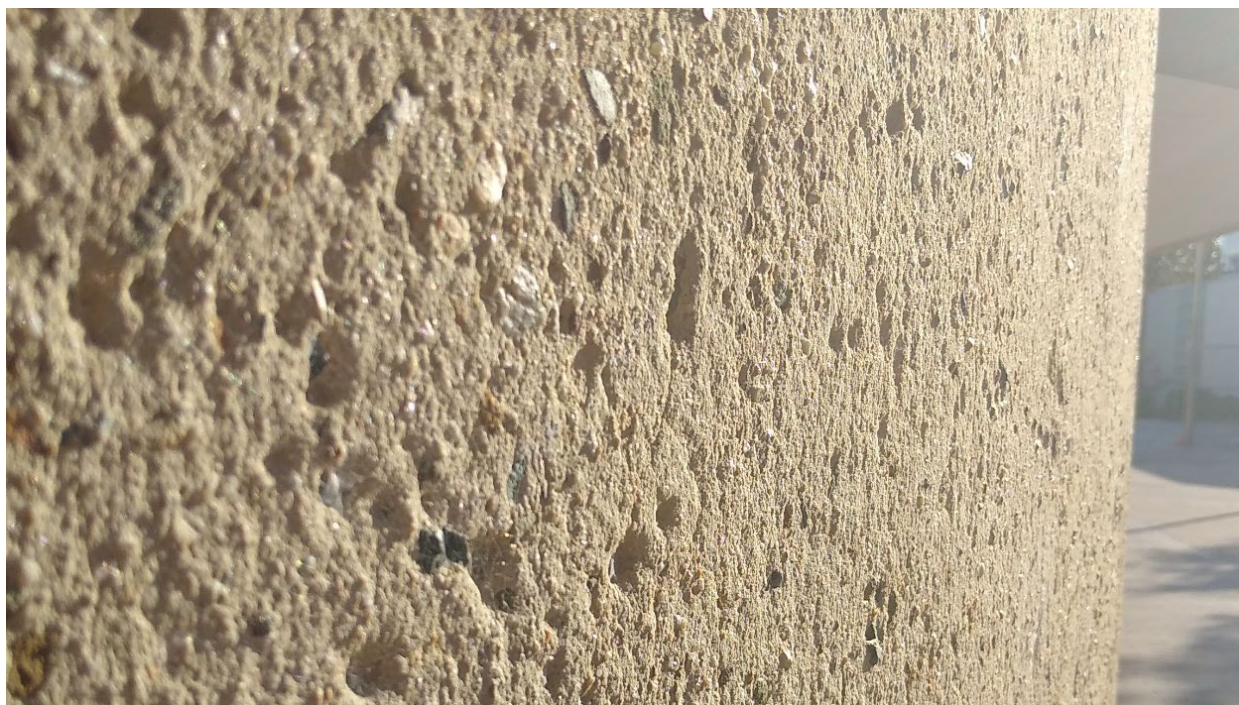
Detail of exposed aggregate sandblasted finish to concrete walls, (ACT Heritage, 2021)
